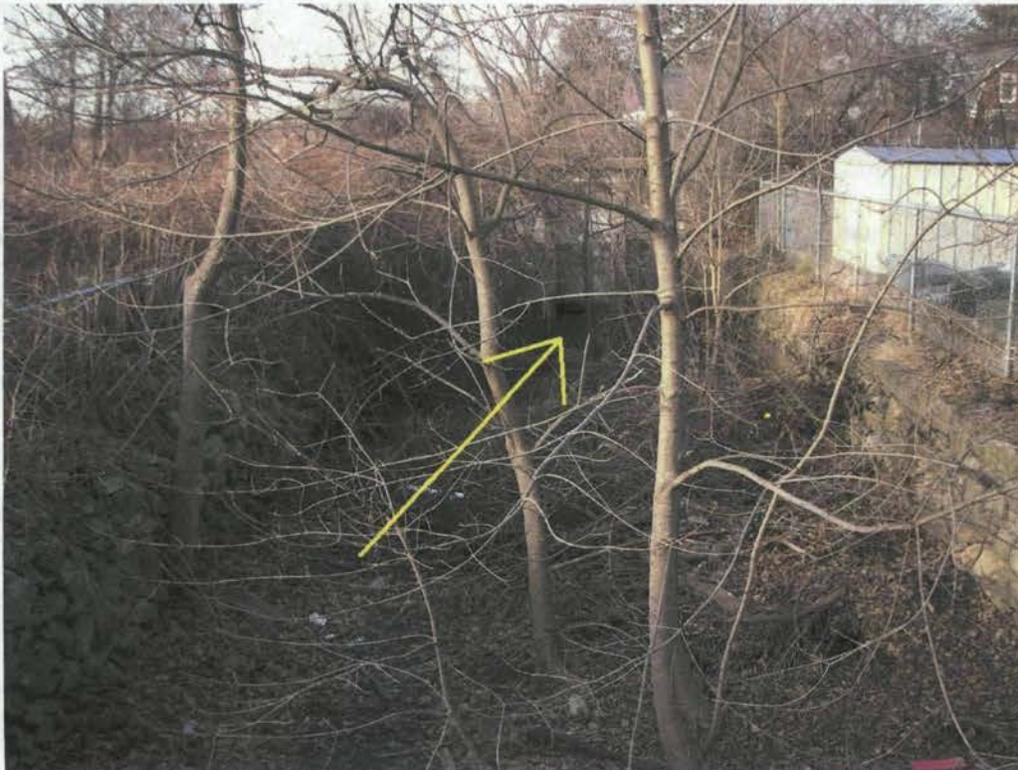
Water Collecting Behind Allendale Dam In Mill Sluiceway
